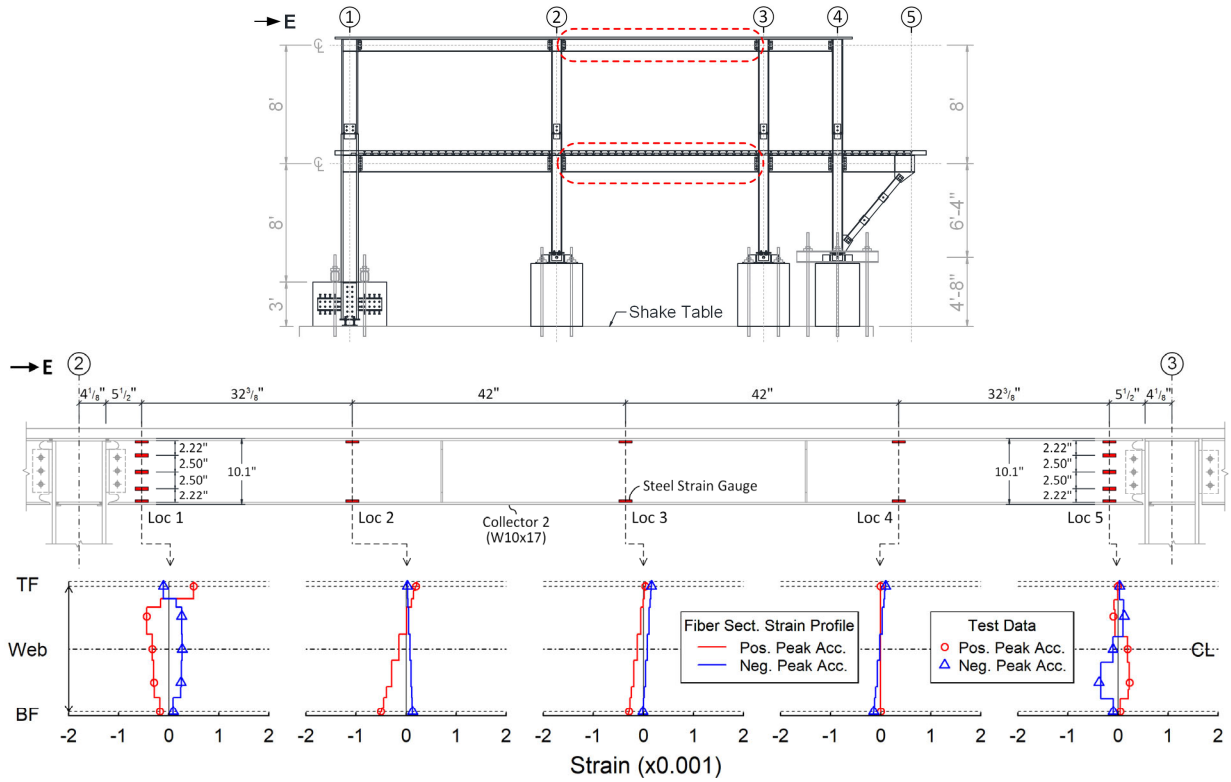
Test 2B-5: Fiber Section Strain Profiles of North Roof Collector 2
